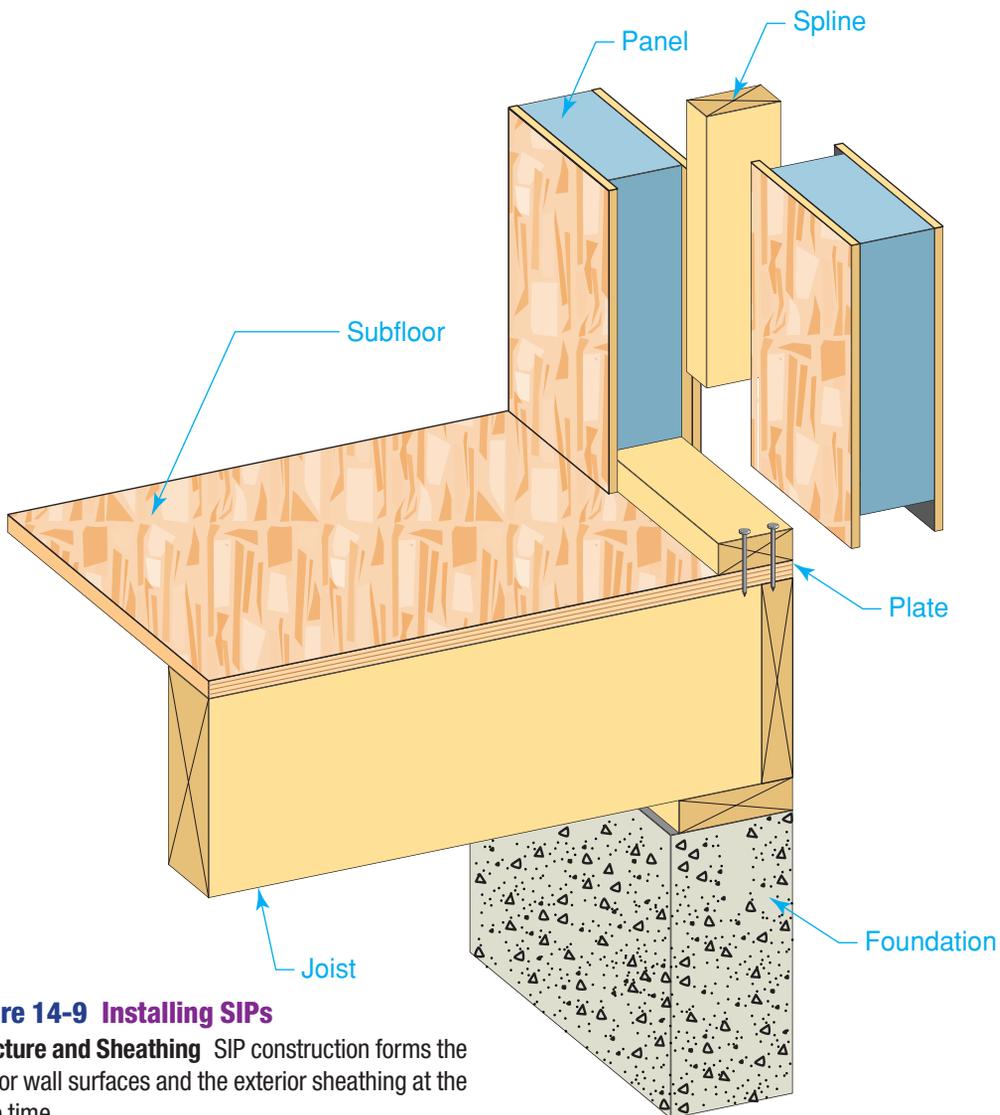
Installing SIPs Structure and Sheathing SIP construction forms the interior wall surfaces and the exterior sheathing at the same time.
